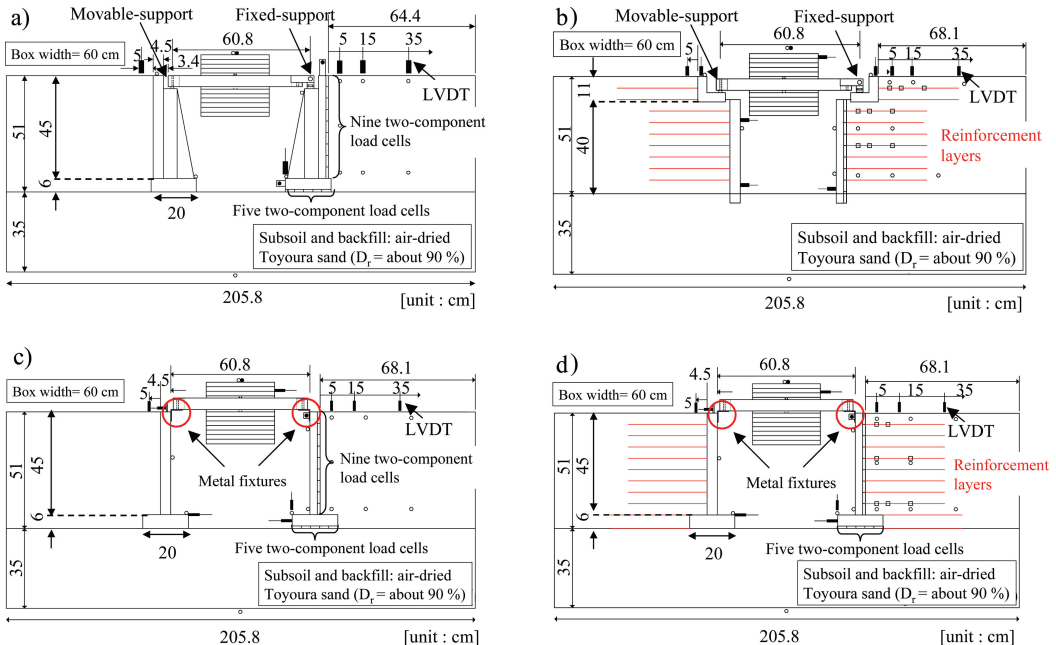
Four bridge models. a) gravity-type abutment bridge; b) GRS RW bridge; c) integral bridge with unreinforced backfill; and d) GRS integral bridge.
